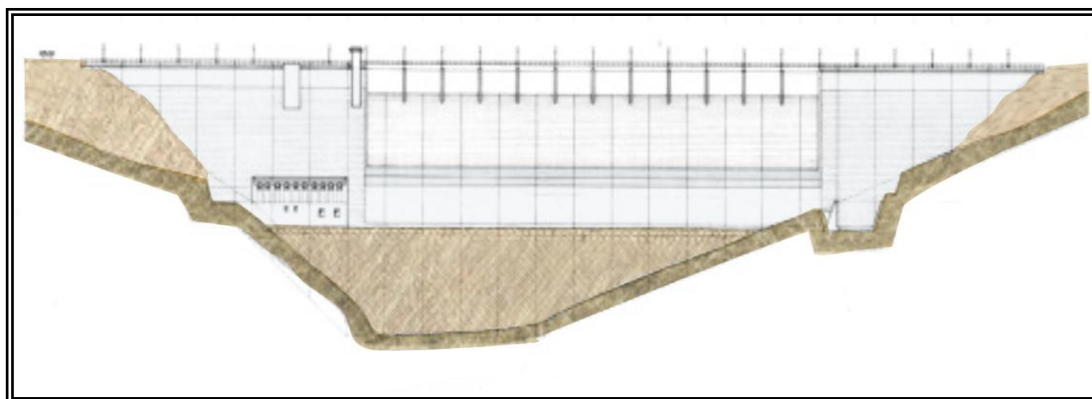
Cross-section of Wadi Hali dam showing dam profile and the spillway.
